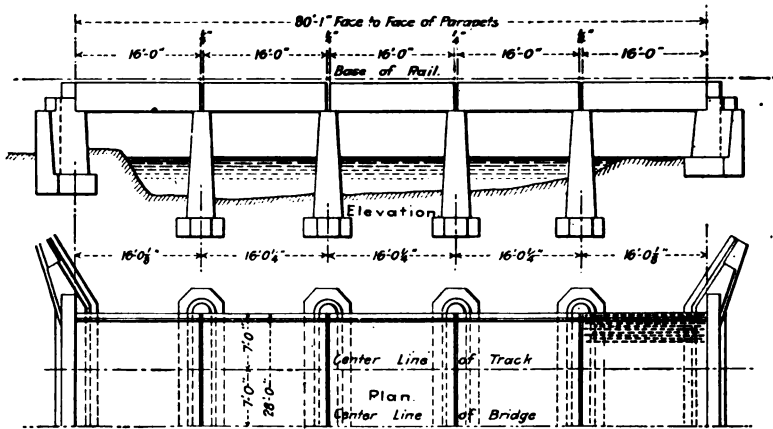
Trestle Over Cave Hollow, C., B. & Q. R. R.
